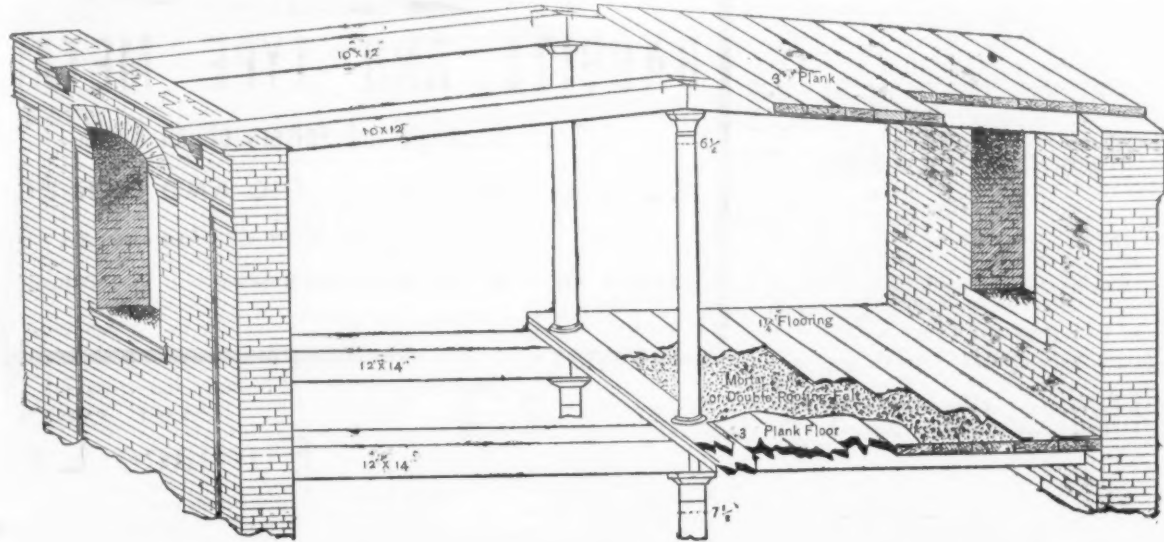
Perspective View showing Arrangement of Floor Beams, Rafters, Columns, &c., and Manner of Laying Floor.
